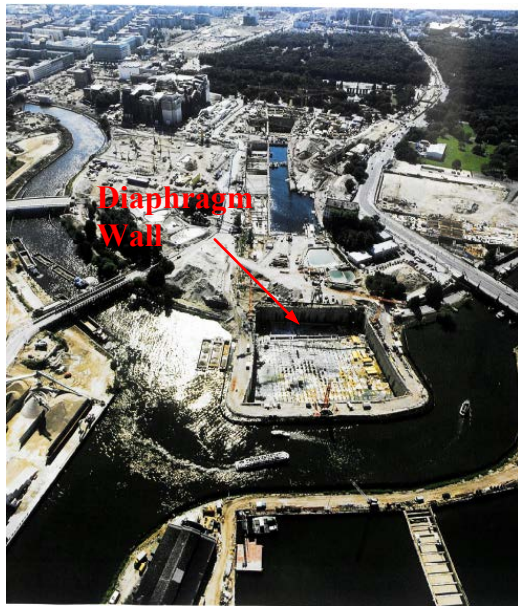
Diaphragm wall construction in Vijzelgracht station (Korff, 2013)
